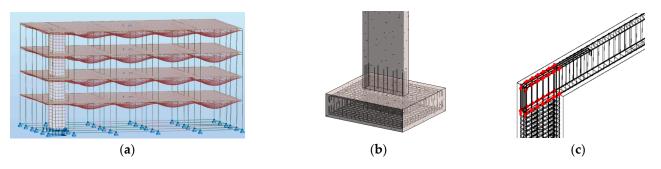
Structural analyses (slabs deflection (a)), performed in Robot, and the reinforcement (foundation (b), and beam (c)), detailed in Revit.
